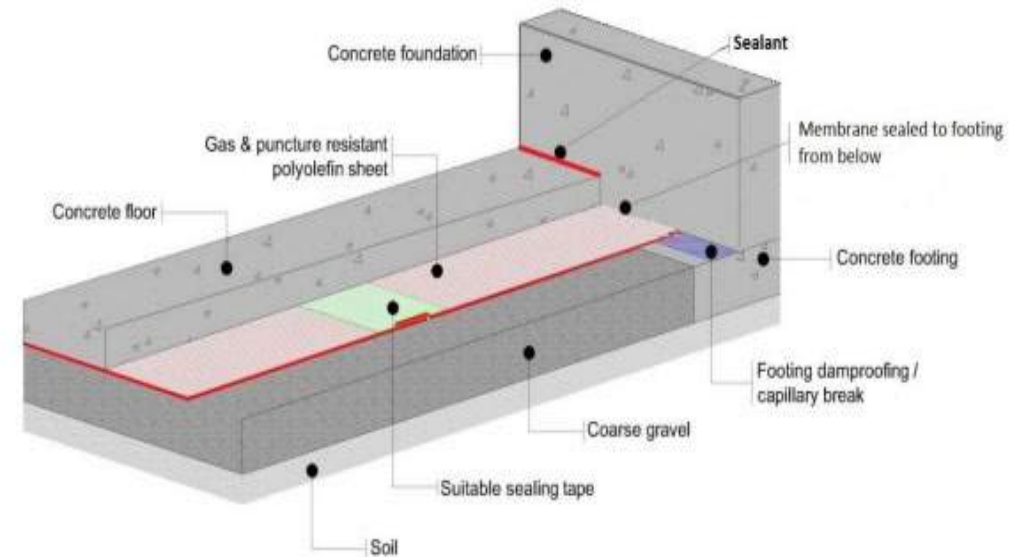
Sealing sub-slab membrane horizontally to concrete footing prior to slab pour and of the slab/wall expansion joint after the slab pour
